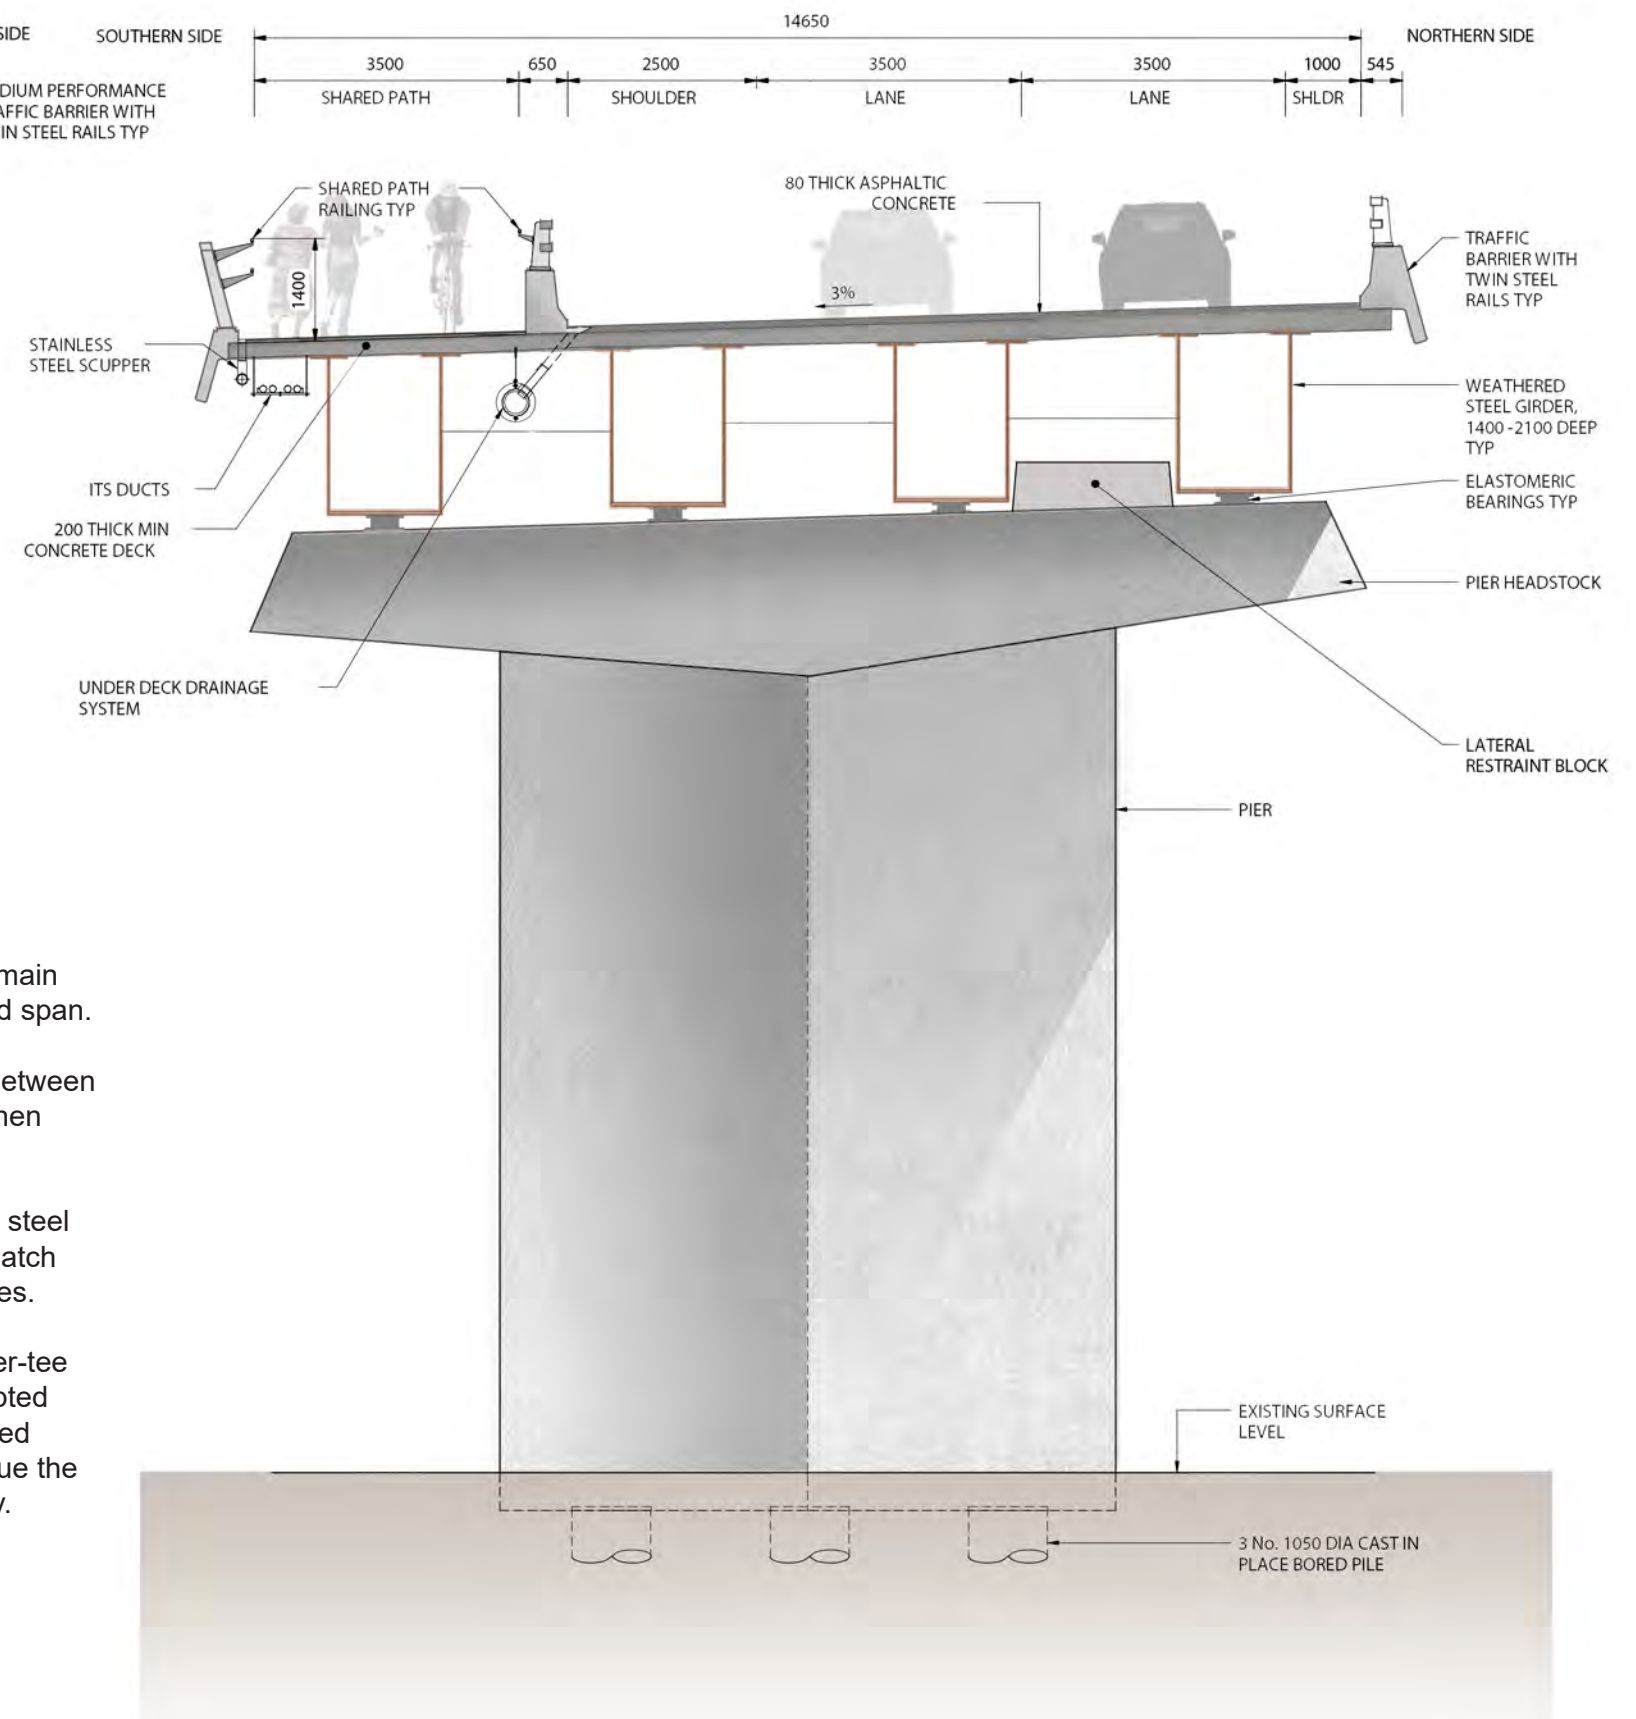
Typical cross section at the main river span near the piers. Scale 1:100
